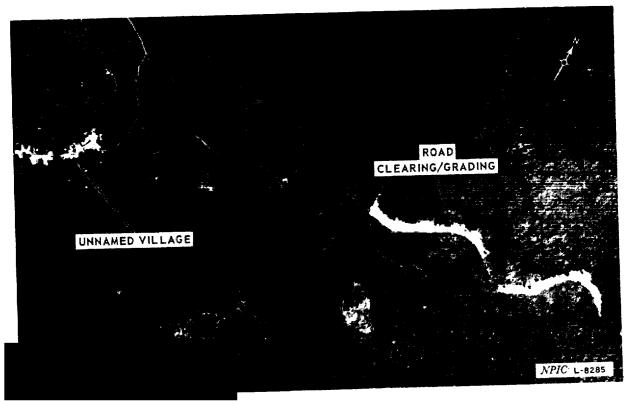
ROAD CONSTRUCTION, ROUTE 19, LAOS
